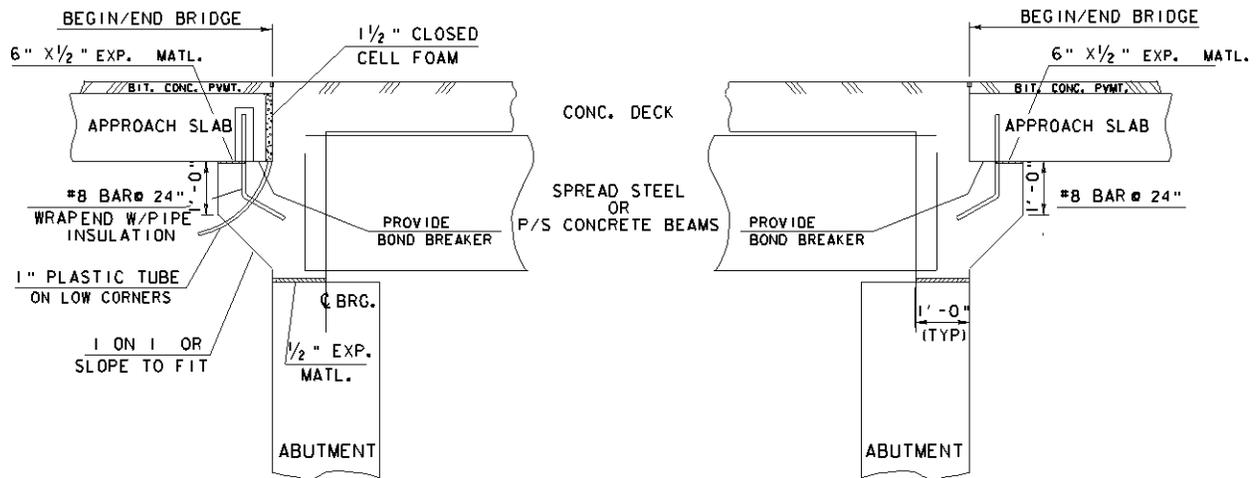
1 Type F – Bridge Ends for intermediate spans with Approach Slabs.
